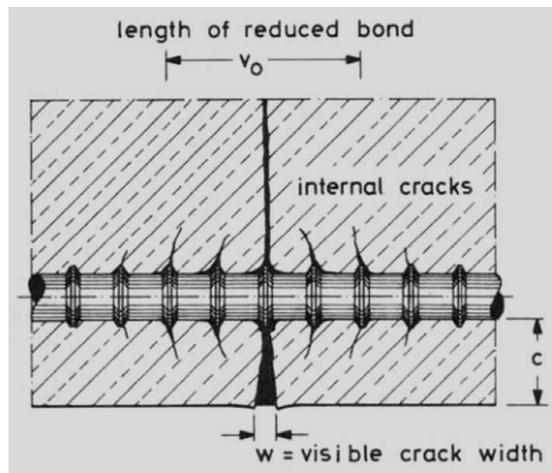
Microcracks forming at every thread crest in reinforced concrete elements; only some cracks extend to the outer edge of the concrete [12]
